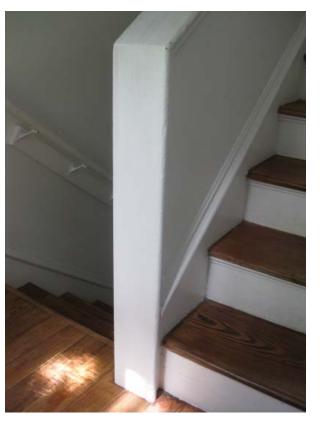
, Stair wall and stairs of the stairway leading from first to second floor, looking northwest from the landing.
